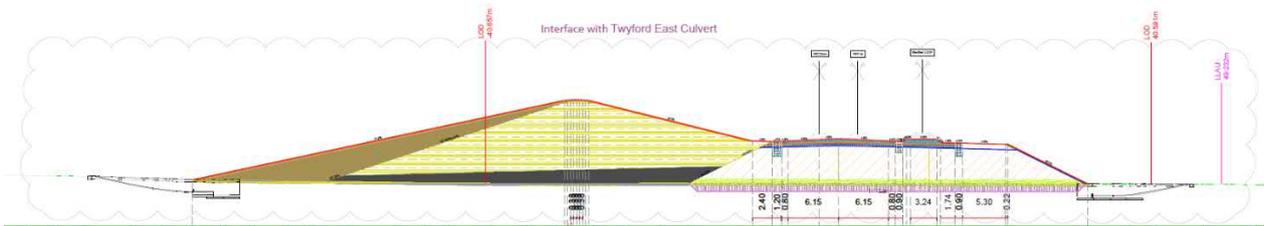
Cross Section of Twyford Embankment at Ch.HS2 81+715
